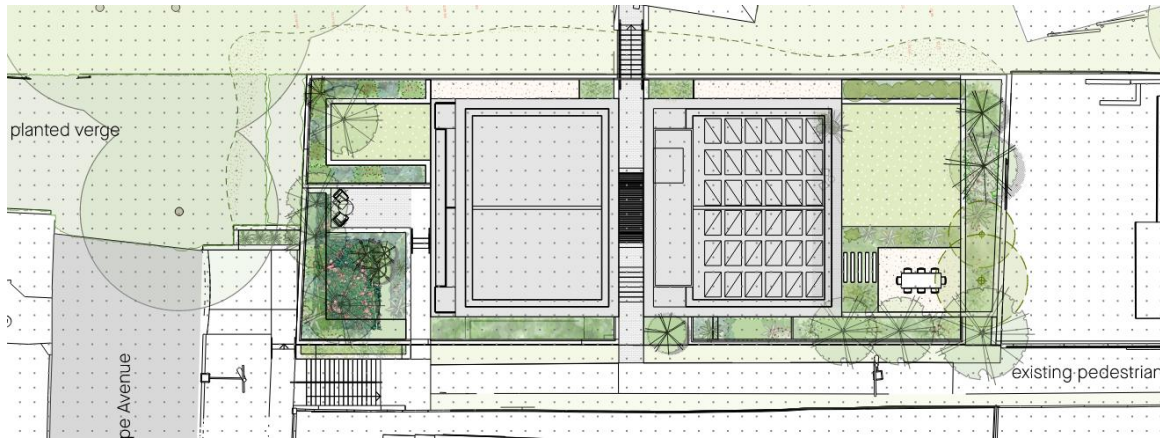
Landscaped plan showing replacement tree planting and extensive planting zones across site.
